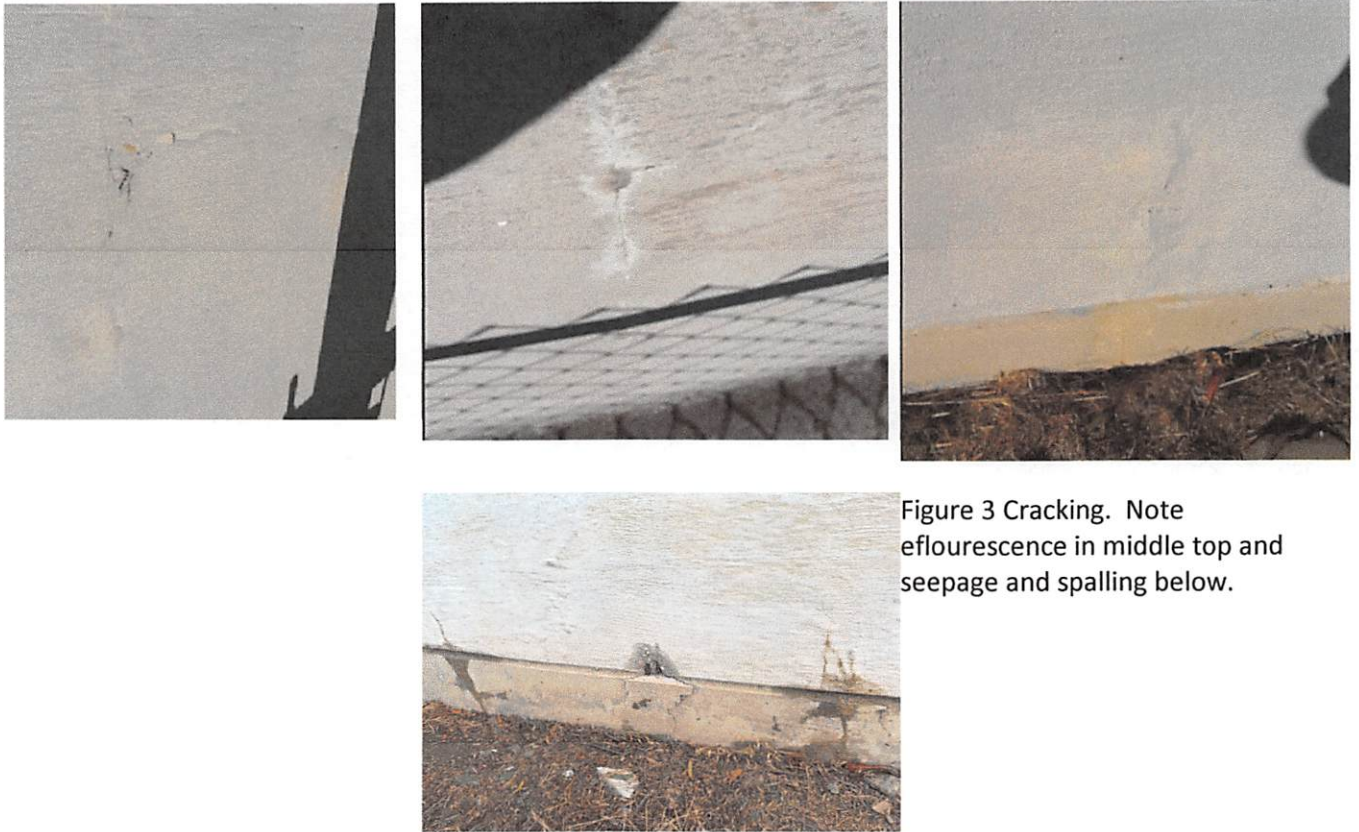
Cracking. Note efflorescence in middle top and seepage and spalling below.
